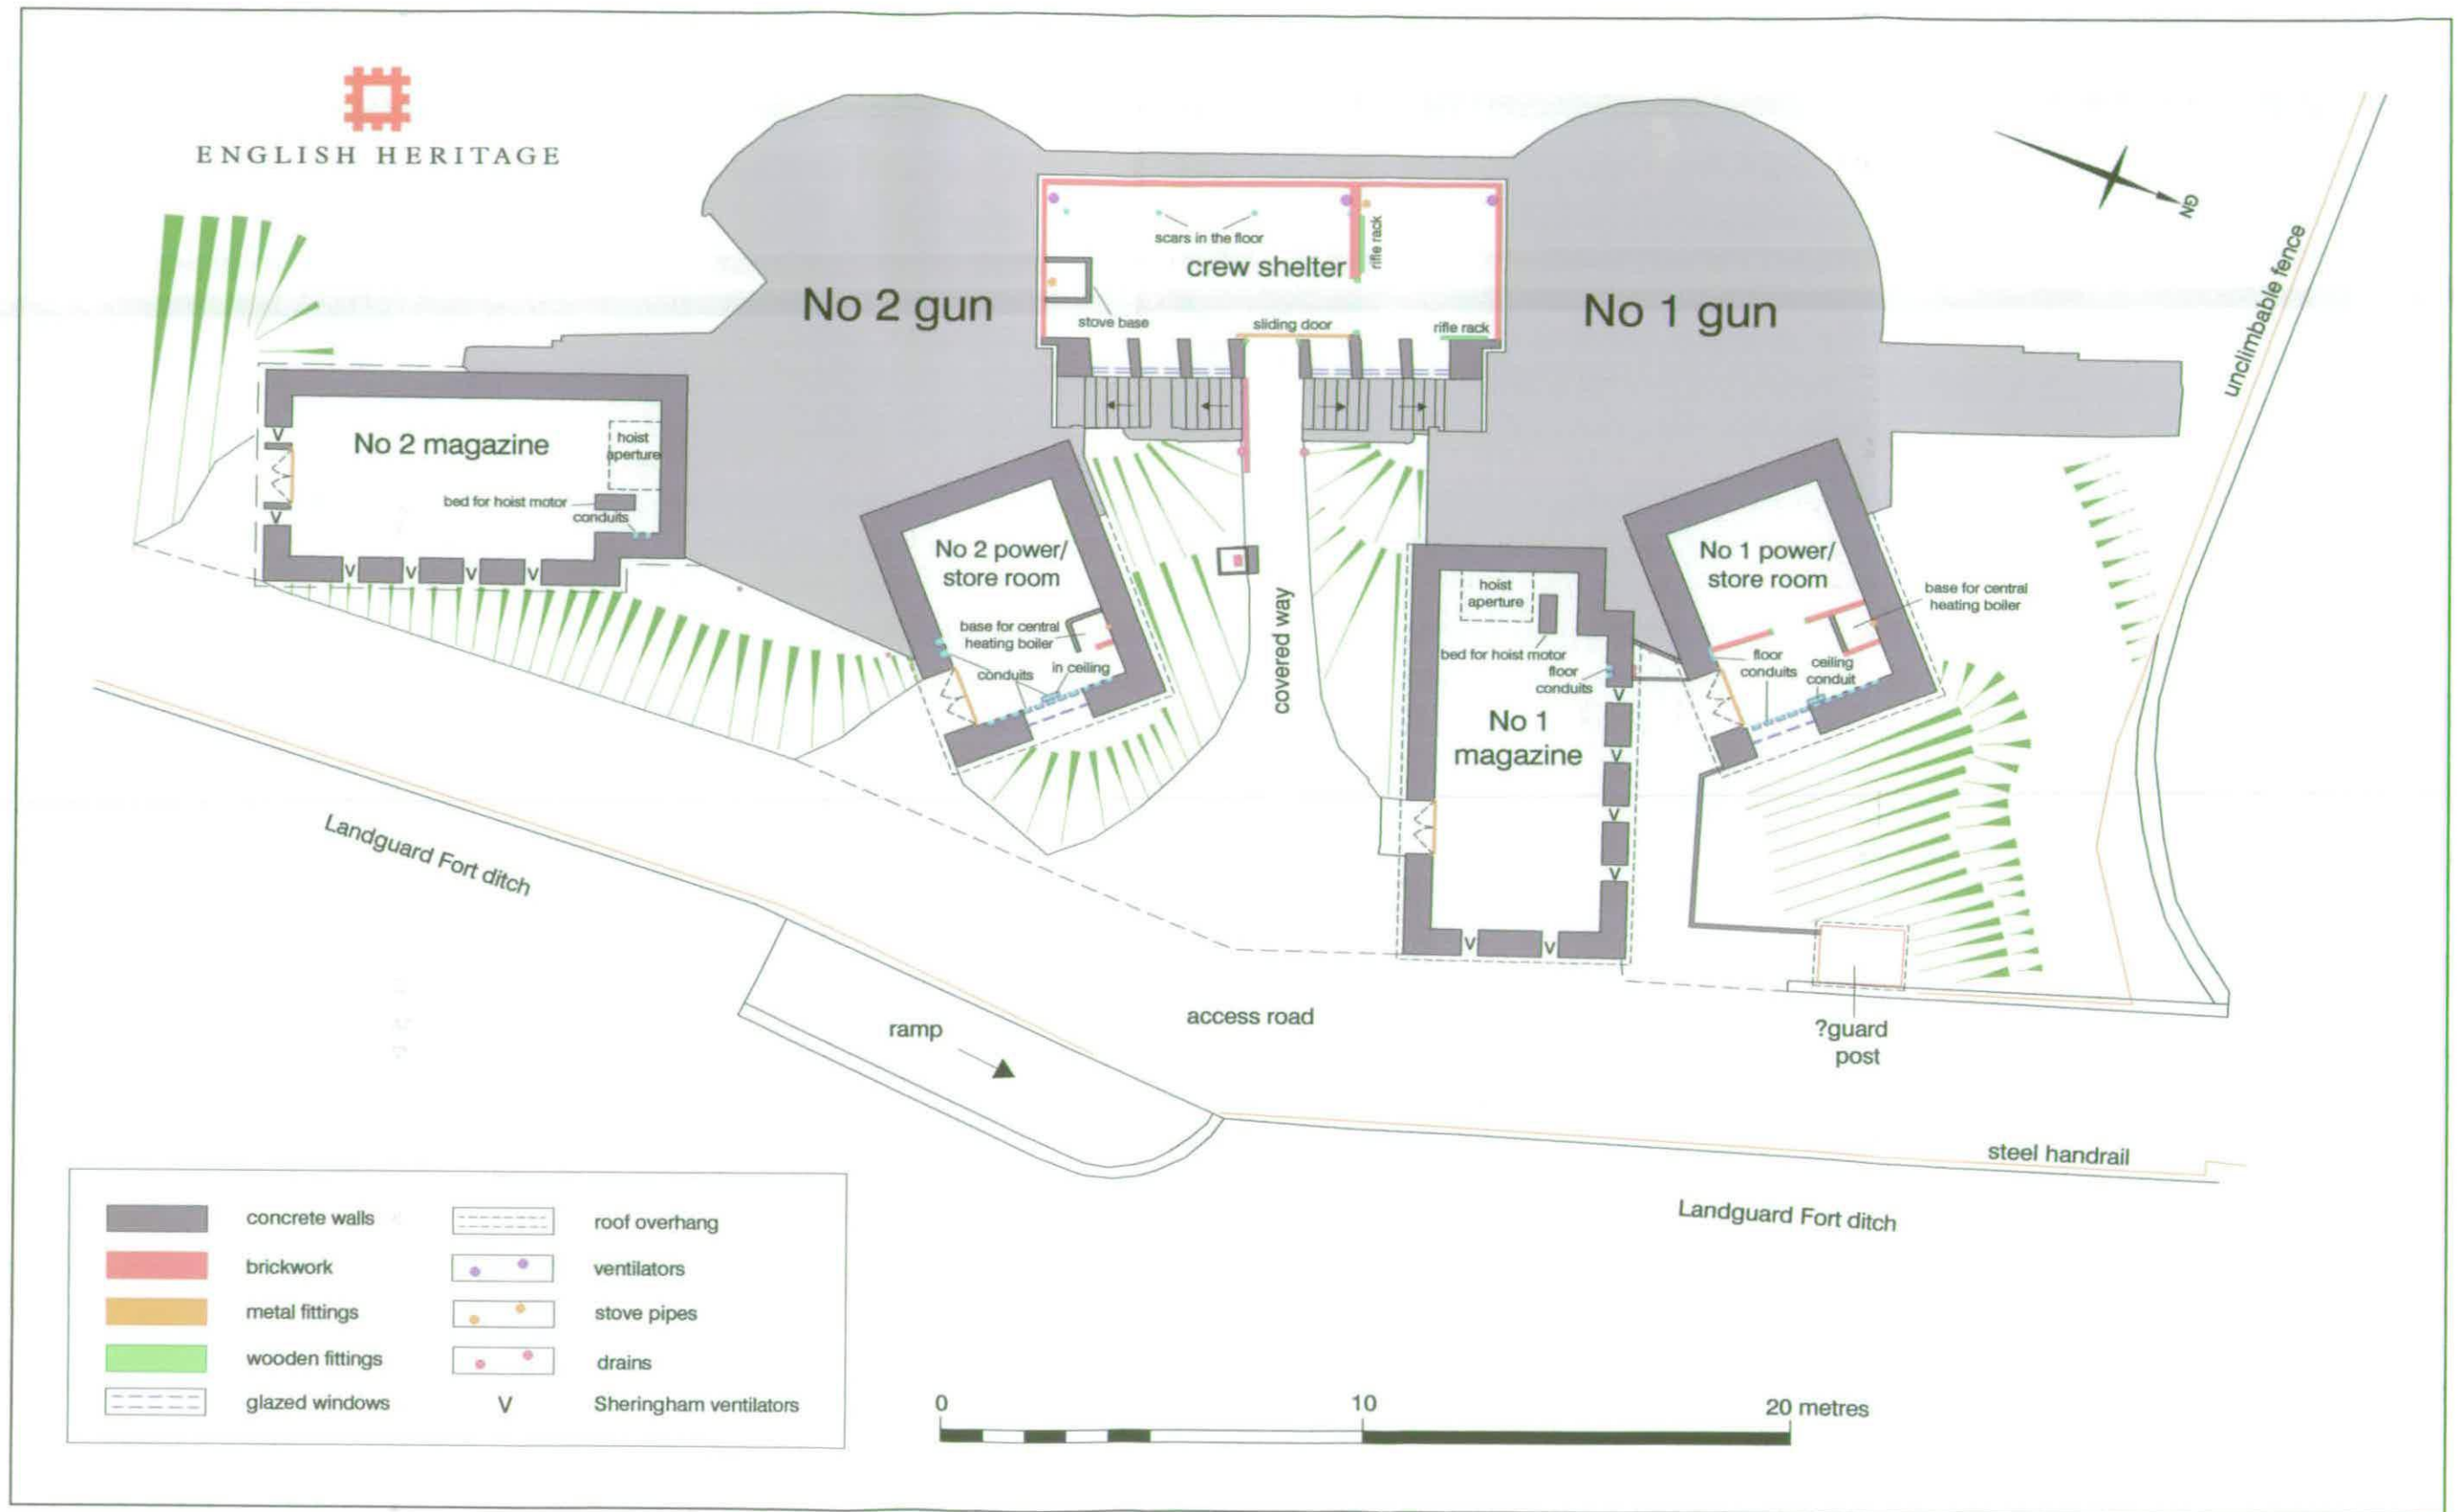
Darell's Battery twin 6-pdr equipment; detailed plan at magazine level showing the magazines, store/power rooms and the crew shelter
